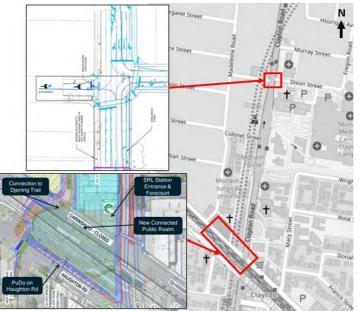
PREFERRED CARINISH ROAD AND SHANDEAU AVENUE/CLAYTON ROAD/DIXON STREET INTERSECTION LAYOUTS
